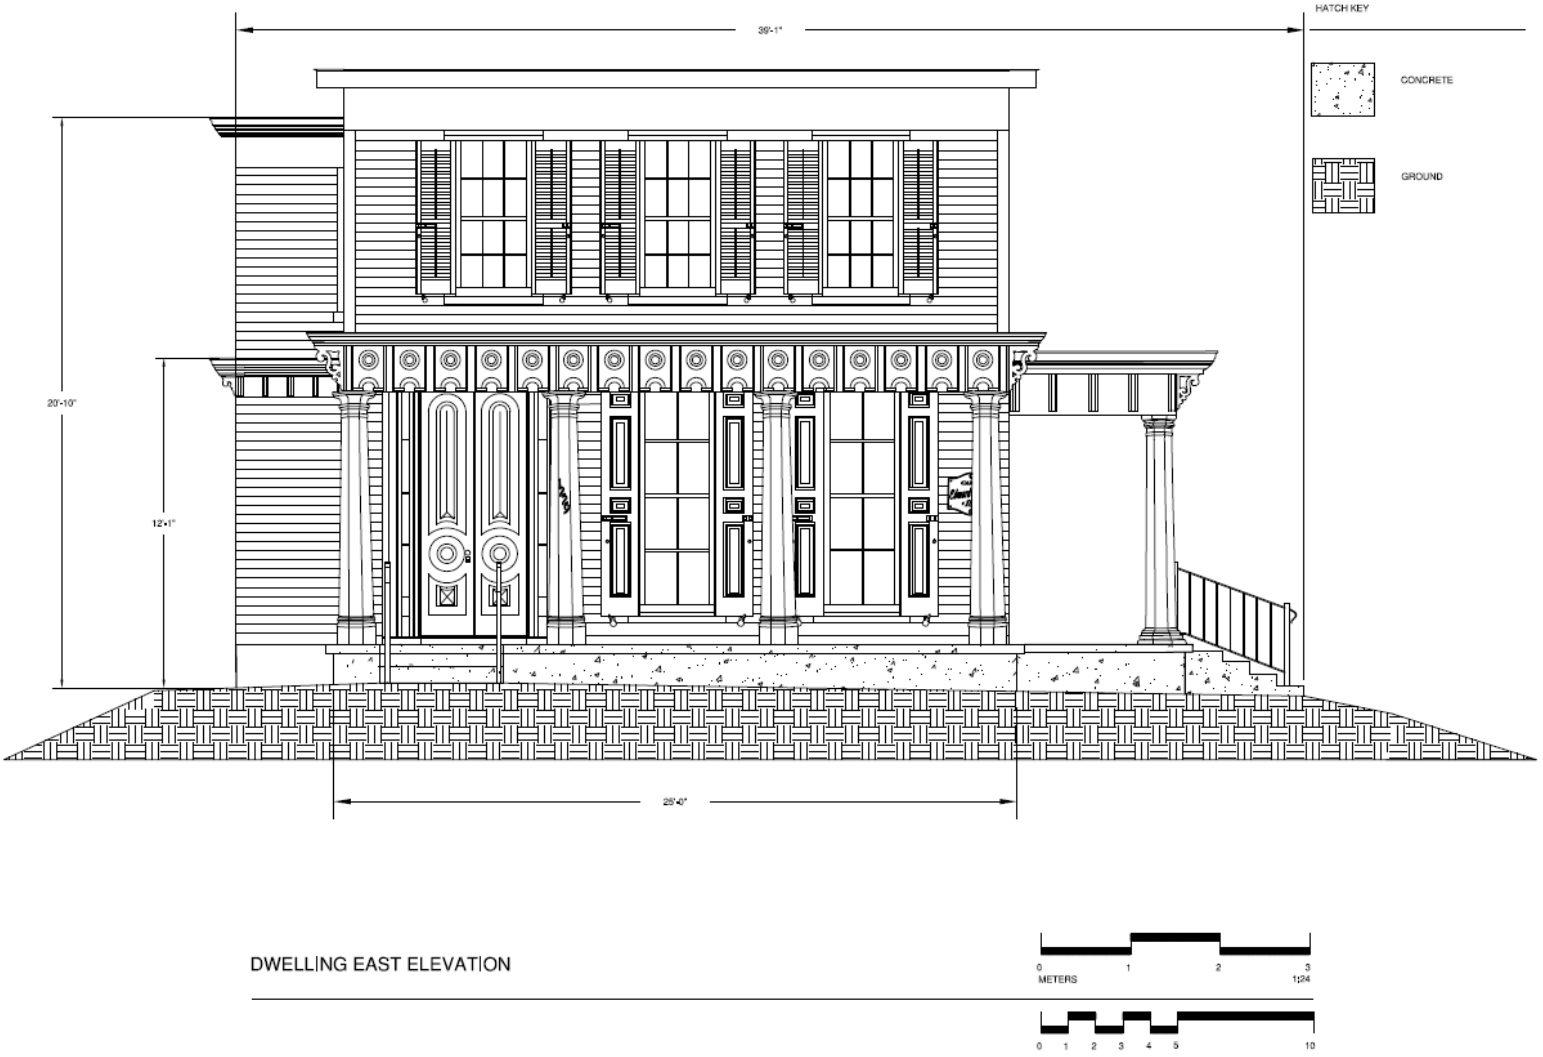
Drawing of the east elevation of the Edward Compton House, 1229 Front Street (Drawn by: Emily Miller)
